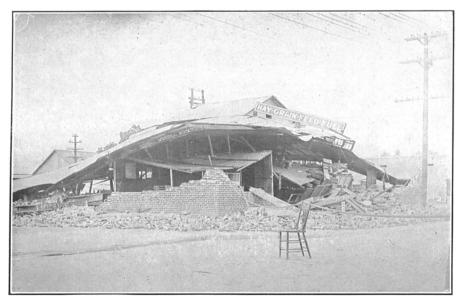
AN EXAMPLE OF THE DAMAGE SUSTAINED BY BRICK BUILDINGS IN AN EARTHQUAKE. The reinforced concrete building shown in the right background was comparatively unharmed. (Photograph by S. D. Townley.)
